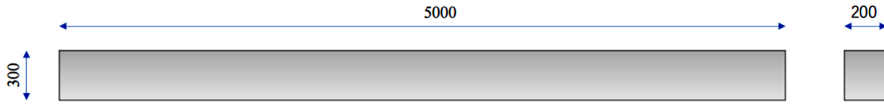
Dimensions of the Original Beam (Unit: mm)
